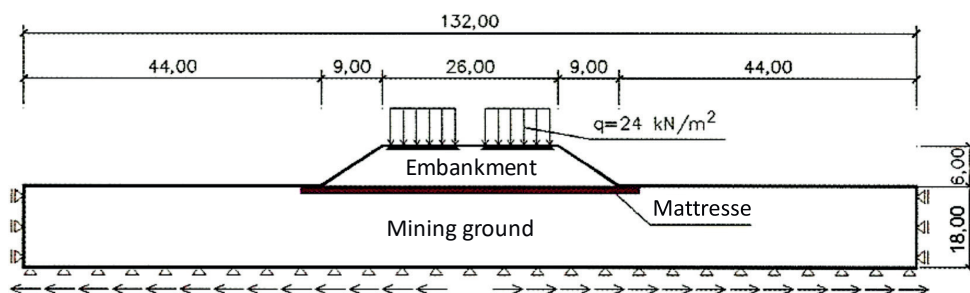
Calculation diagram for a railway embankment located on a mining substrate, with horizontal reinforcement at the base level
